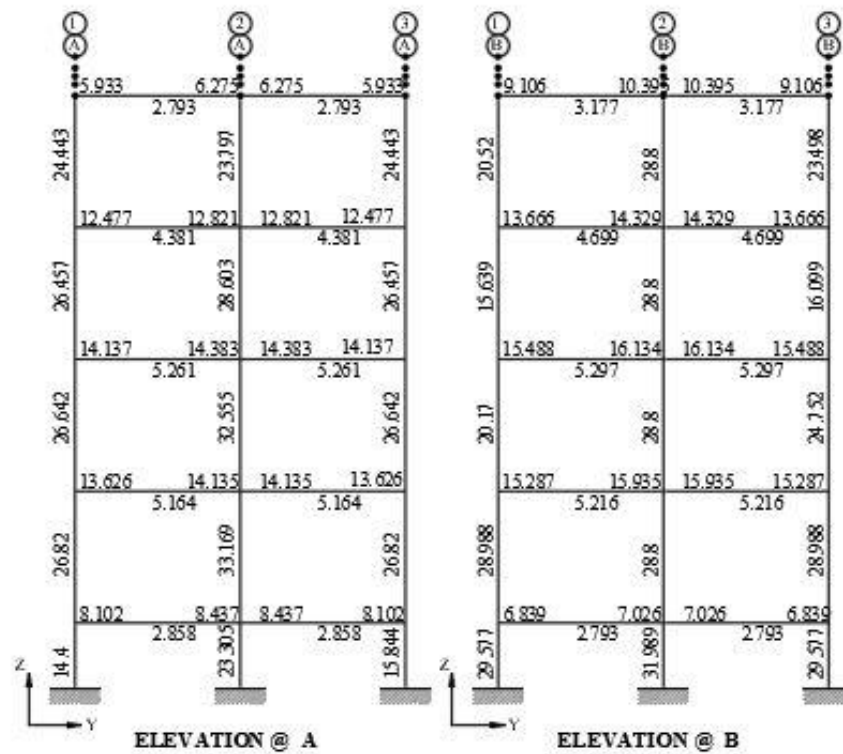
Reinforcement details for 4 storey building for grid A & B
